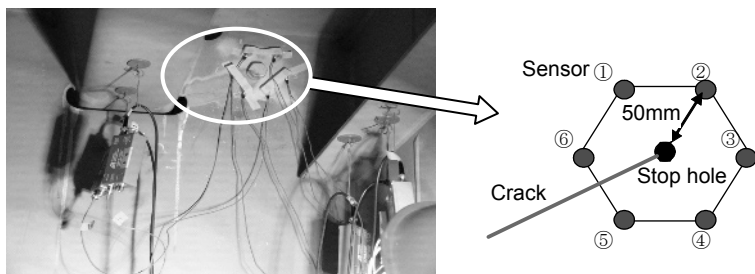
AE measurement on lateral beam connecting with U-shaped rib plate.
